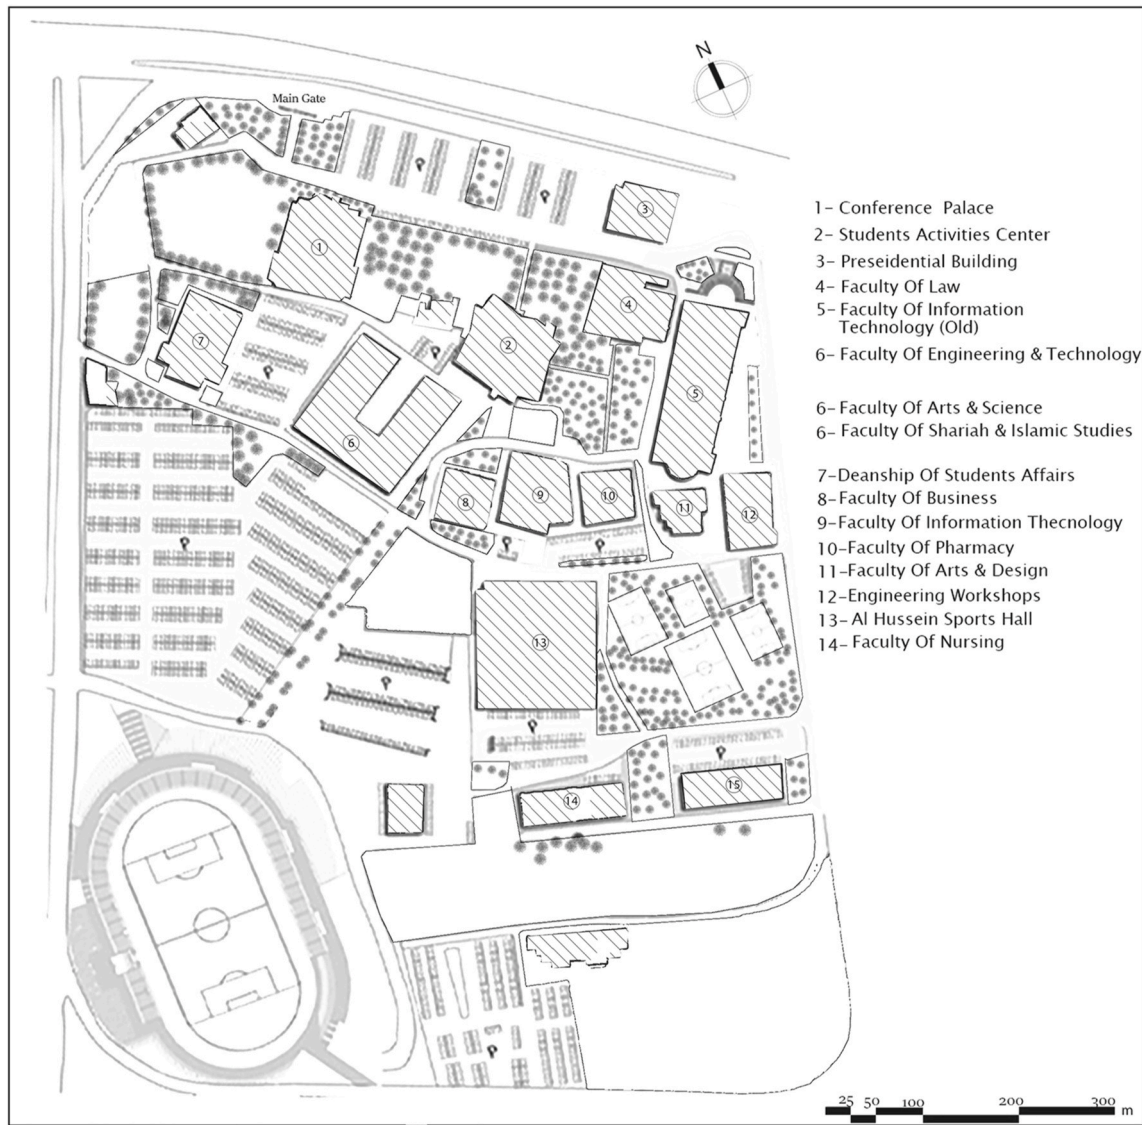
ASU Campus; main buildings, facilities and open spaces.
